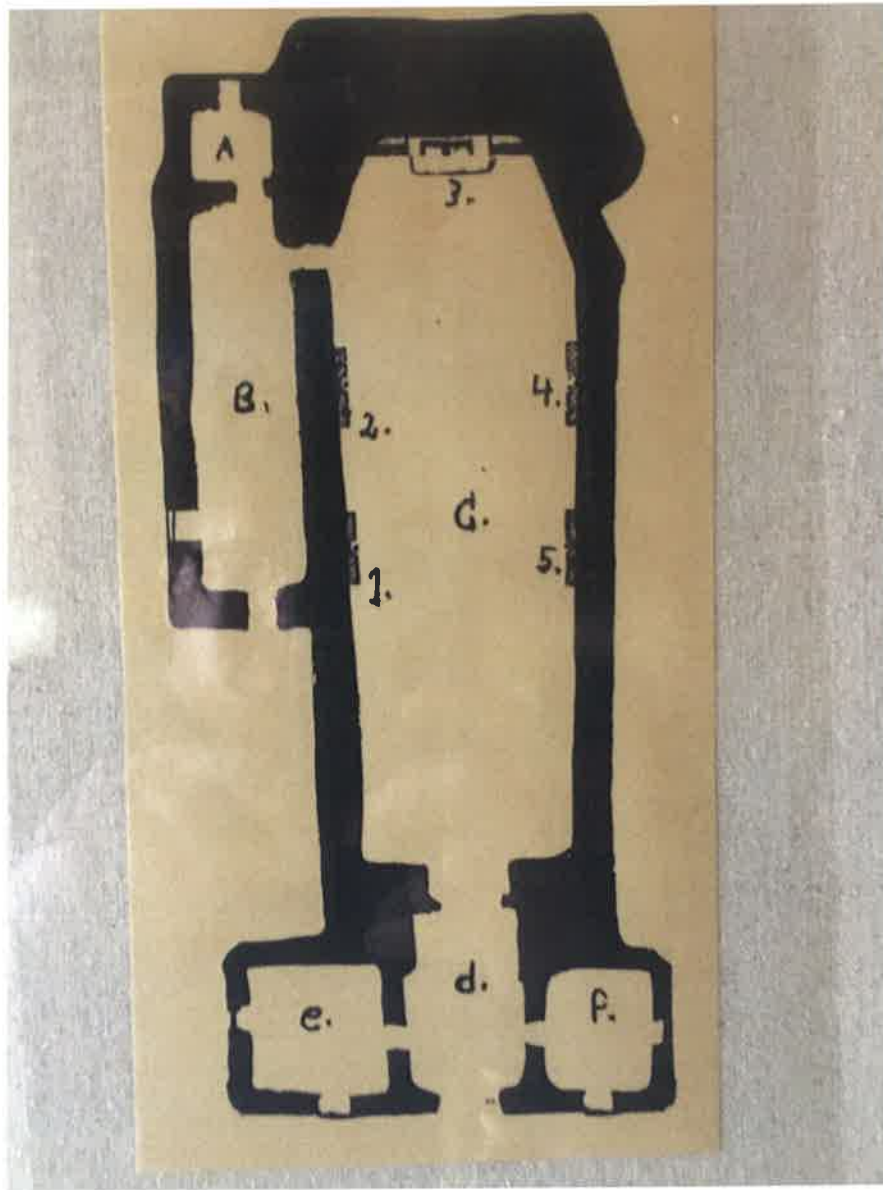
Floor Plan of the Sanctuary (photo taken from the site)
